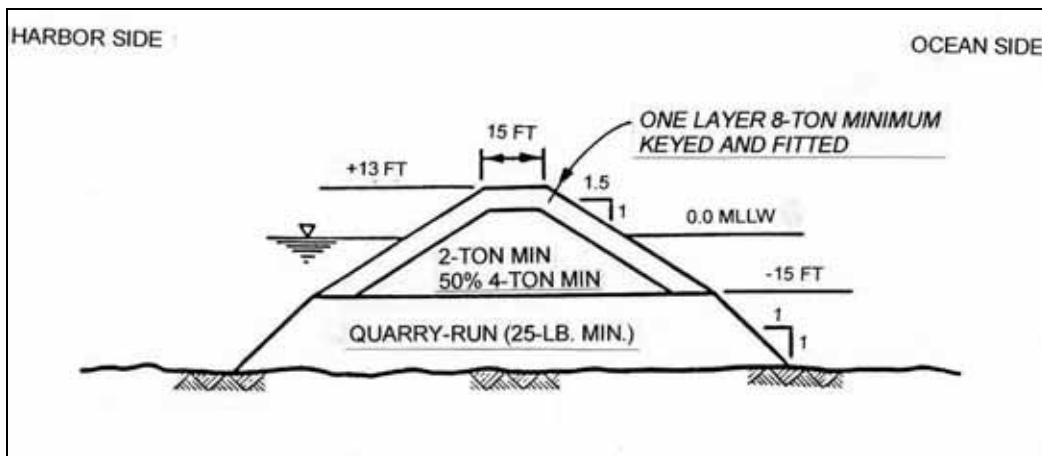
Typical cross-section of 1913-1931 Kahului breakwater trunk construction.
